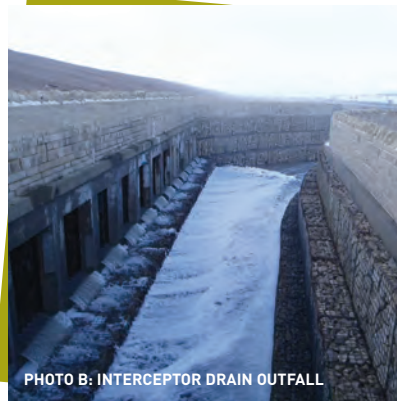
PHOTO B: INTERCEPTOR DRAIN OUTFALL
